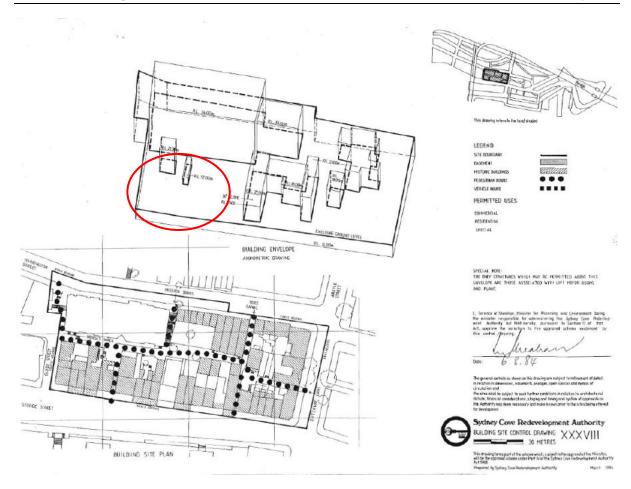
SCRA Building Site Control Drawing 'XXXVIII' showing the buildings circled in red, and permitted uses. Source: SCRA Scheme 1984
